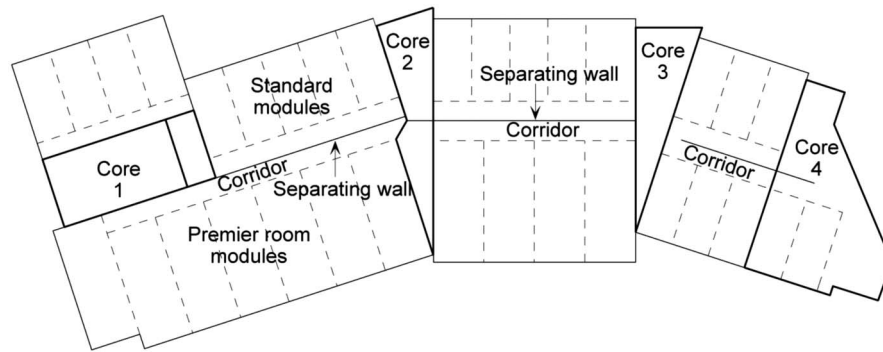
Plan of modular building at Bond Street, Bristol, showing the irregular-shaped core positions
